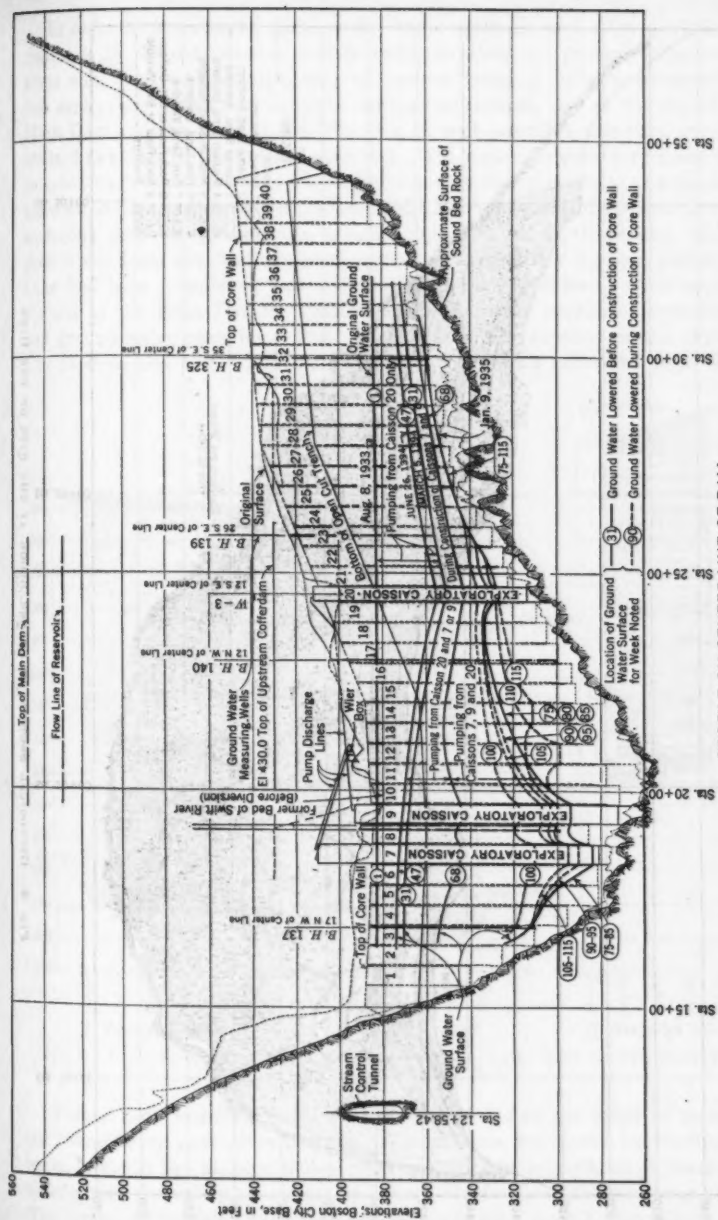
CROSS-SECTION OF BEAVER BROOK AT THE SITE OF QUABBIN DAMS
